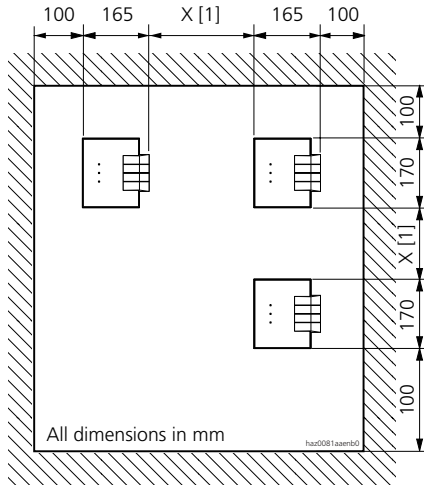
Dimensional drawing for wall-mounting the mounting bracket
